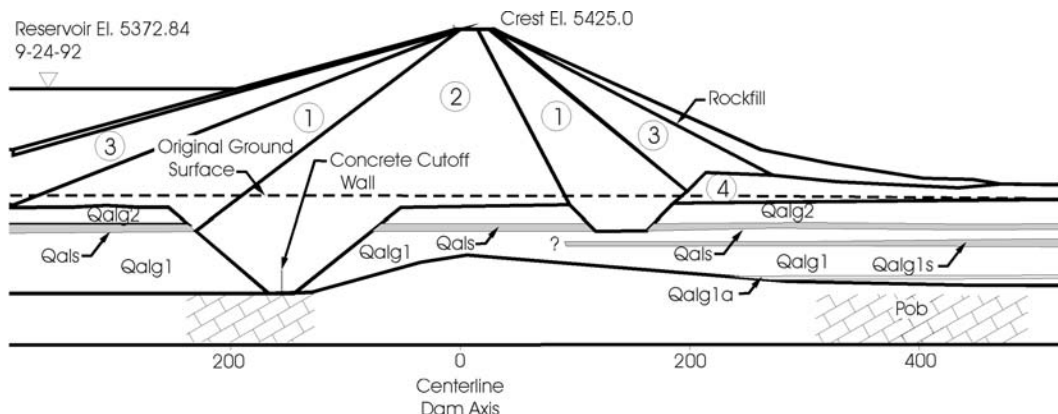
Cross section of Deer Creek Dam and Foundation (Existing Condition)
